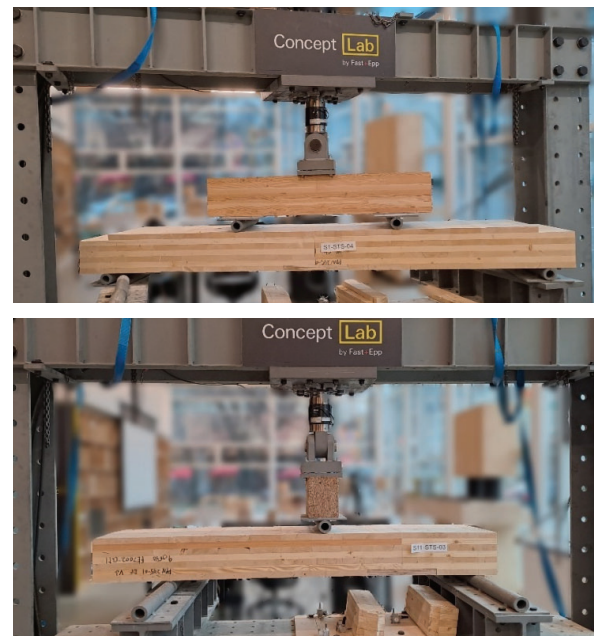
Test set-ups: a) four-point bending test; b) three-point bending test
